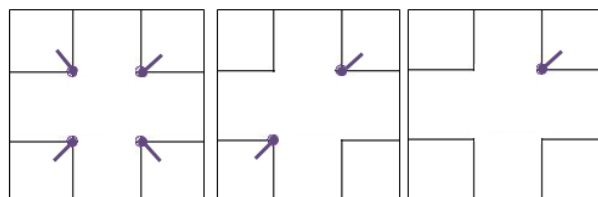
Modeled Luminaire Layouts for Rural Conventional Four-Leg Intersections
